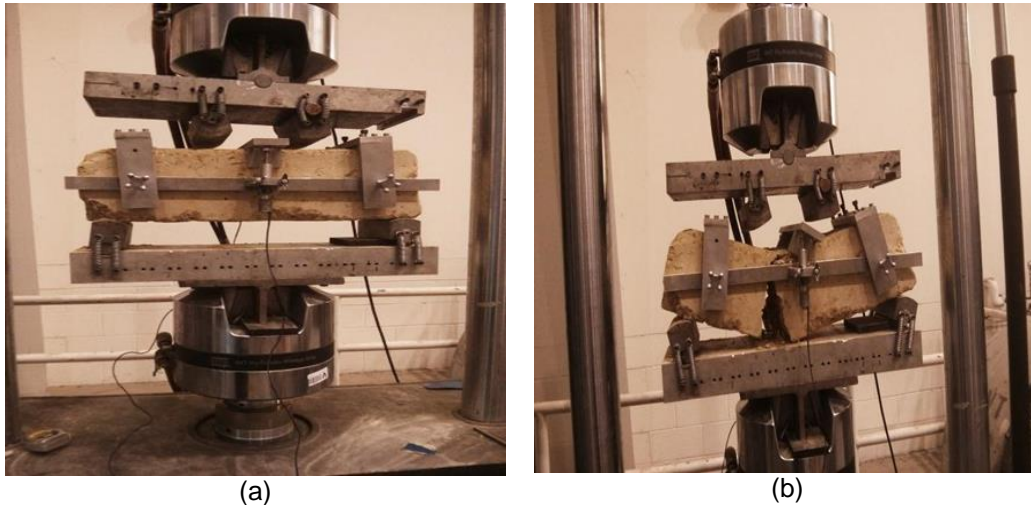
CLSM specimen beam flexure test by MTS machine (a) test set-up (b) after failure
